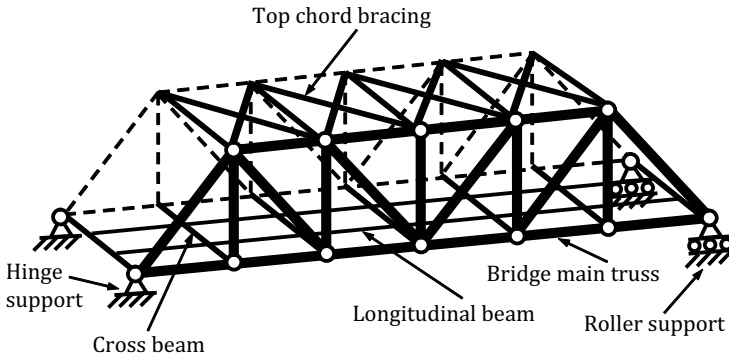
Pin-connected truss as the main structure of a bridge (only main truss pins are shown and deck not shown for clarity).
